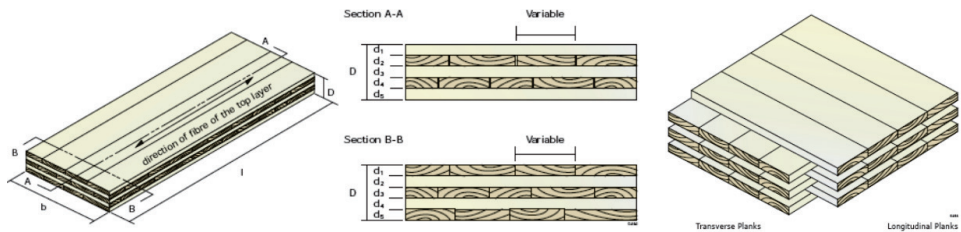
Cross Laminated Timber (source: CLT Handbook FP Innovations (Gagnon & Pirvu, 2011))
